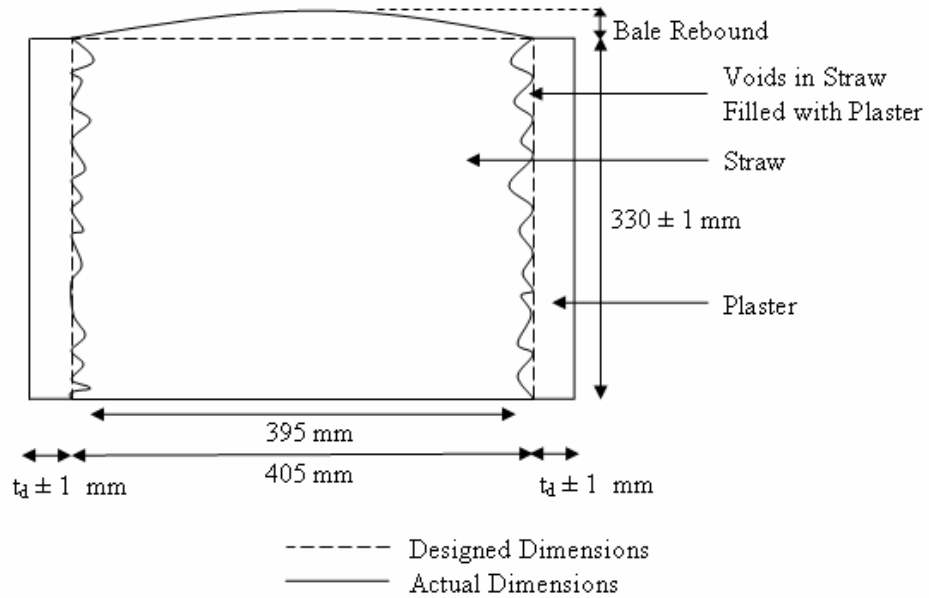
Dimensions of Fabricated Plastered Straw Bale Assemblies
